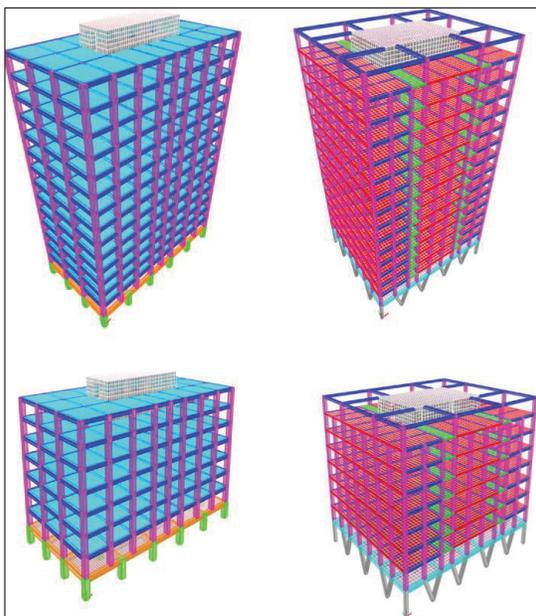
Isometric view of 8 and 15 story ETABS models of Office (left) and Residential (right) buildings.
